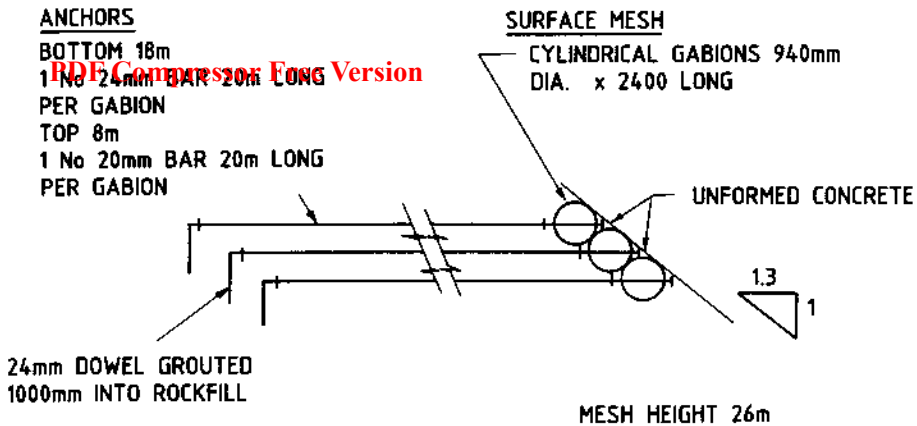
Steel mesh reinforcement for Murchison Dam (ANCOLD 1982).
